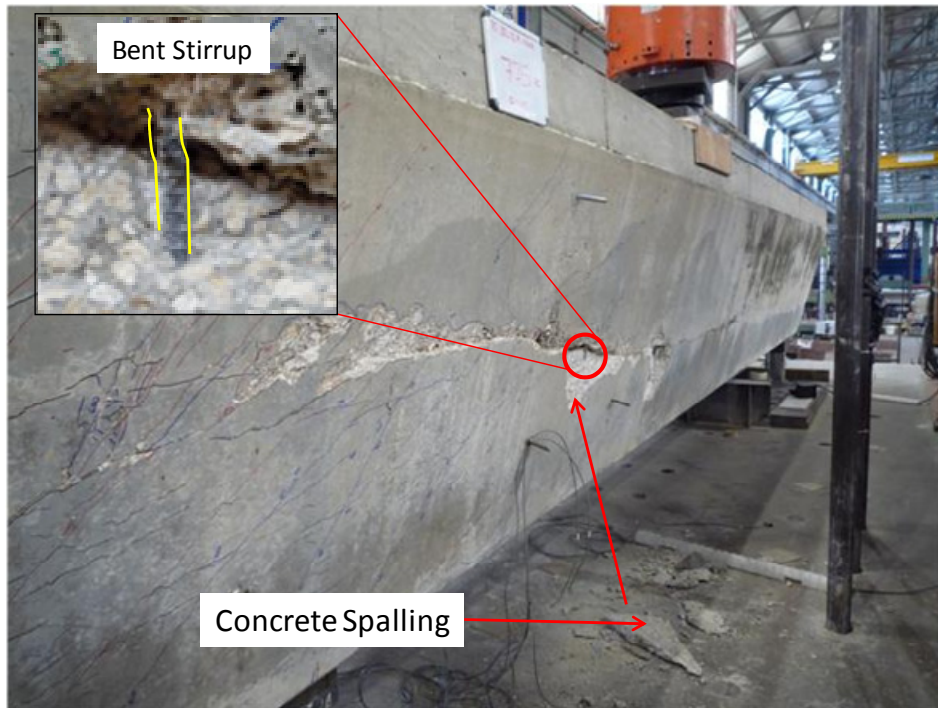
Concrete spalling and bent stirrup at failure
